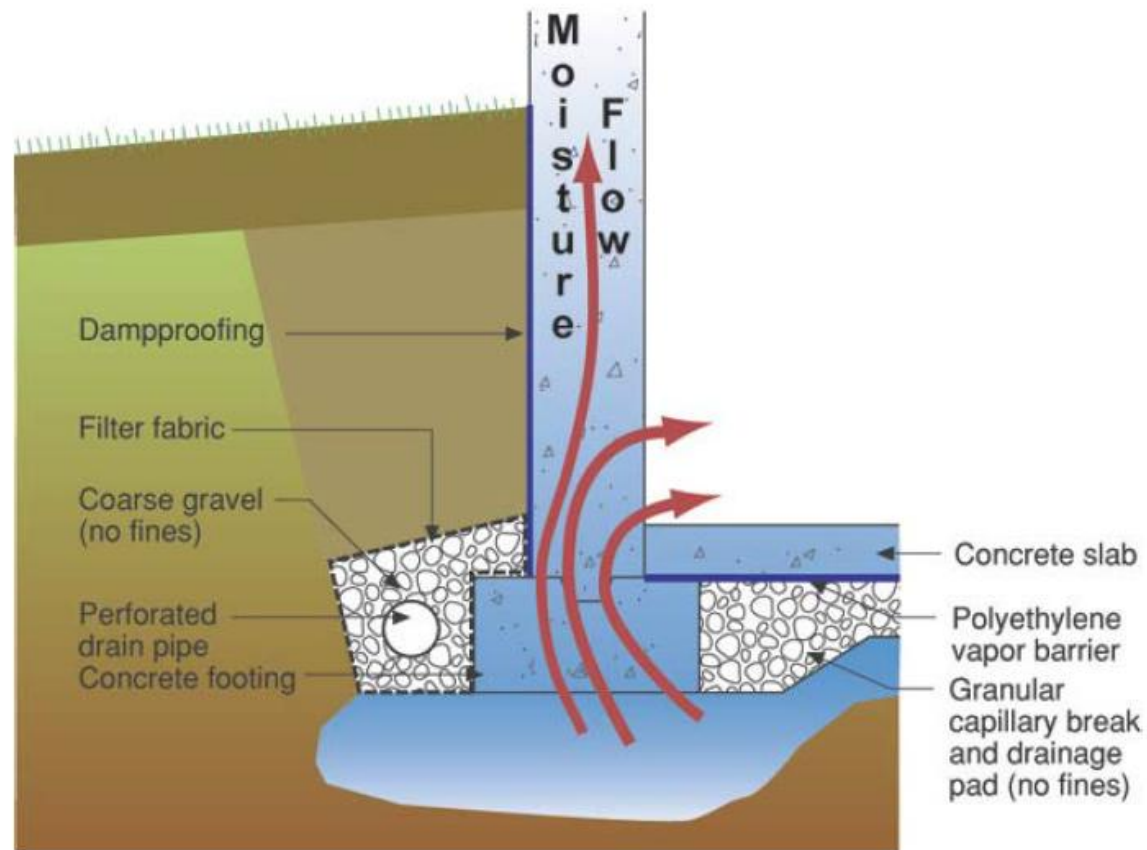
Capillary uptake of water through footing-to-foundation-wall connection
